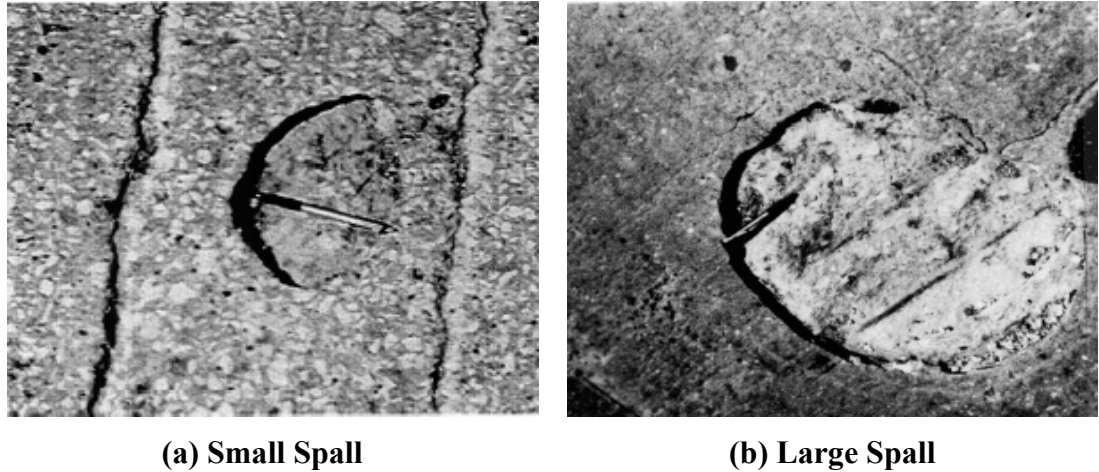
Types of Spalling (ACI 201.1R-92).
